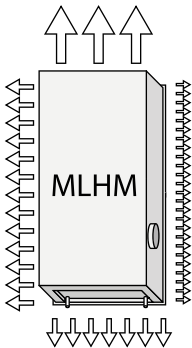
Nozzle setting example PARASOL two-module unit - MLHM.
